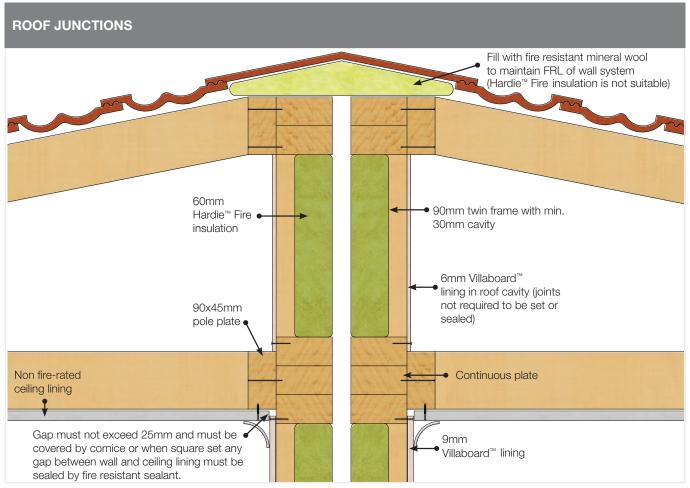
HARDIE™ SMART INTERTENANCY WALL SYSTEM WITH FRAMED ROOF
